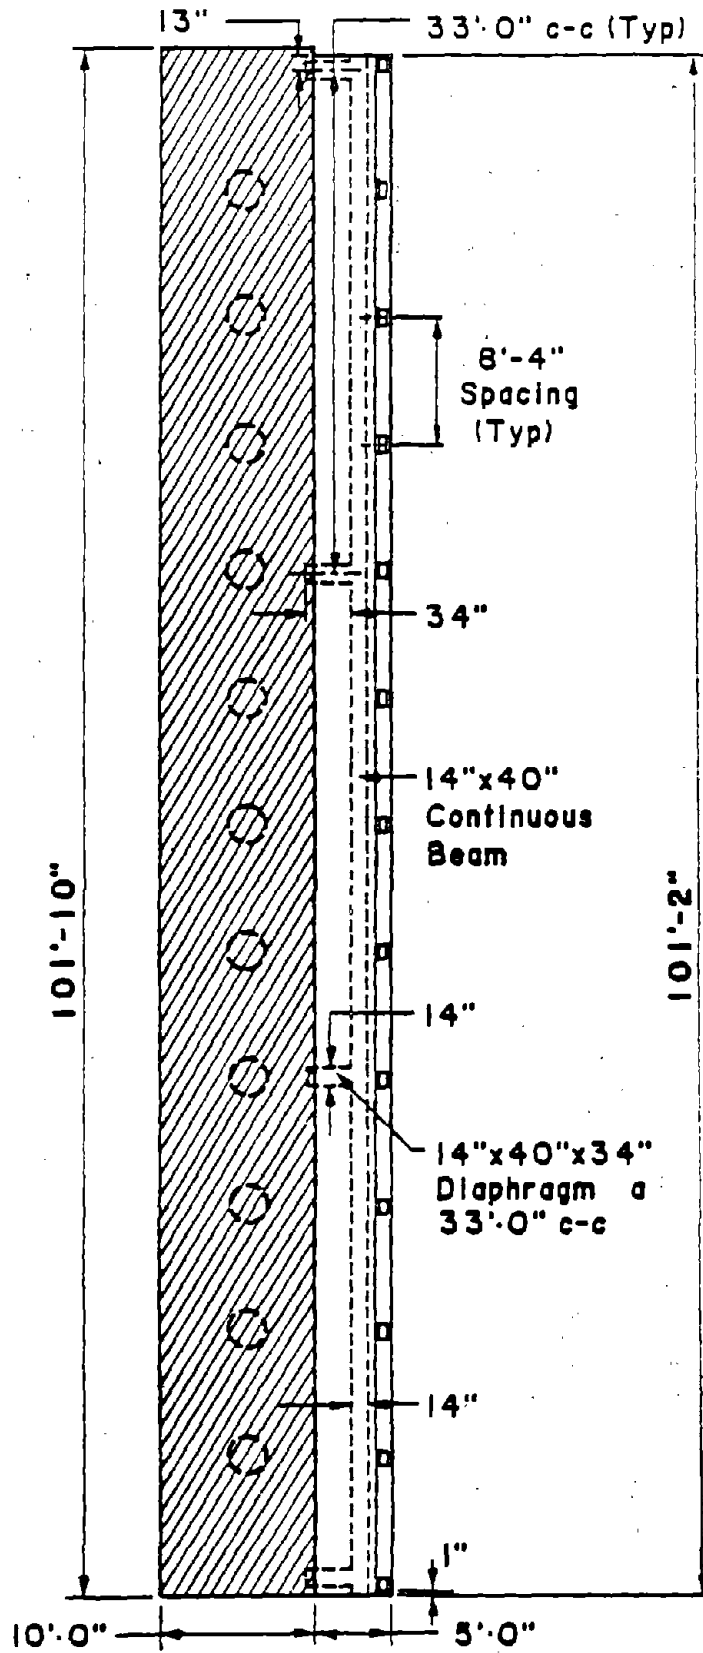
Dimensions and elevation of the modified T5 bridgerail. (43)
